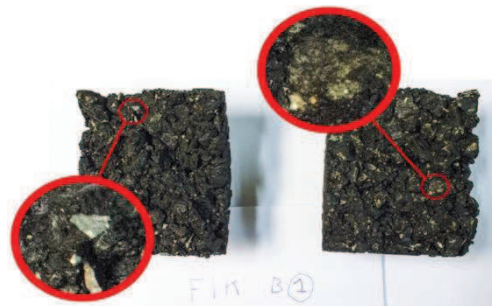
Fracture surface before (left) and after (right) conditioning
